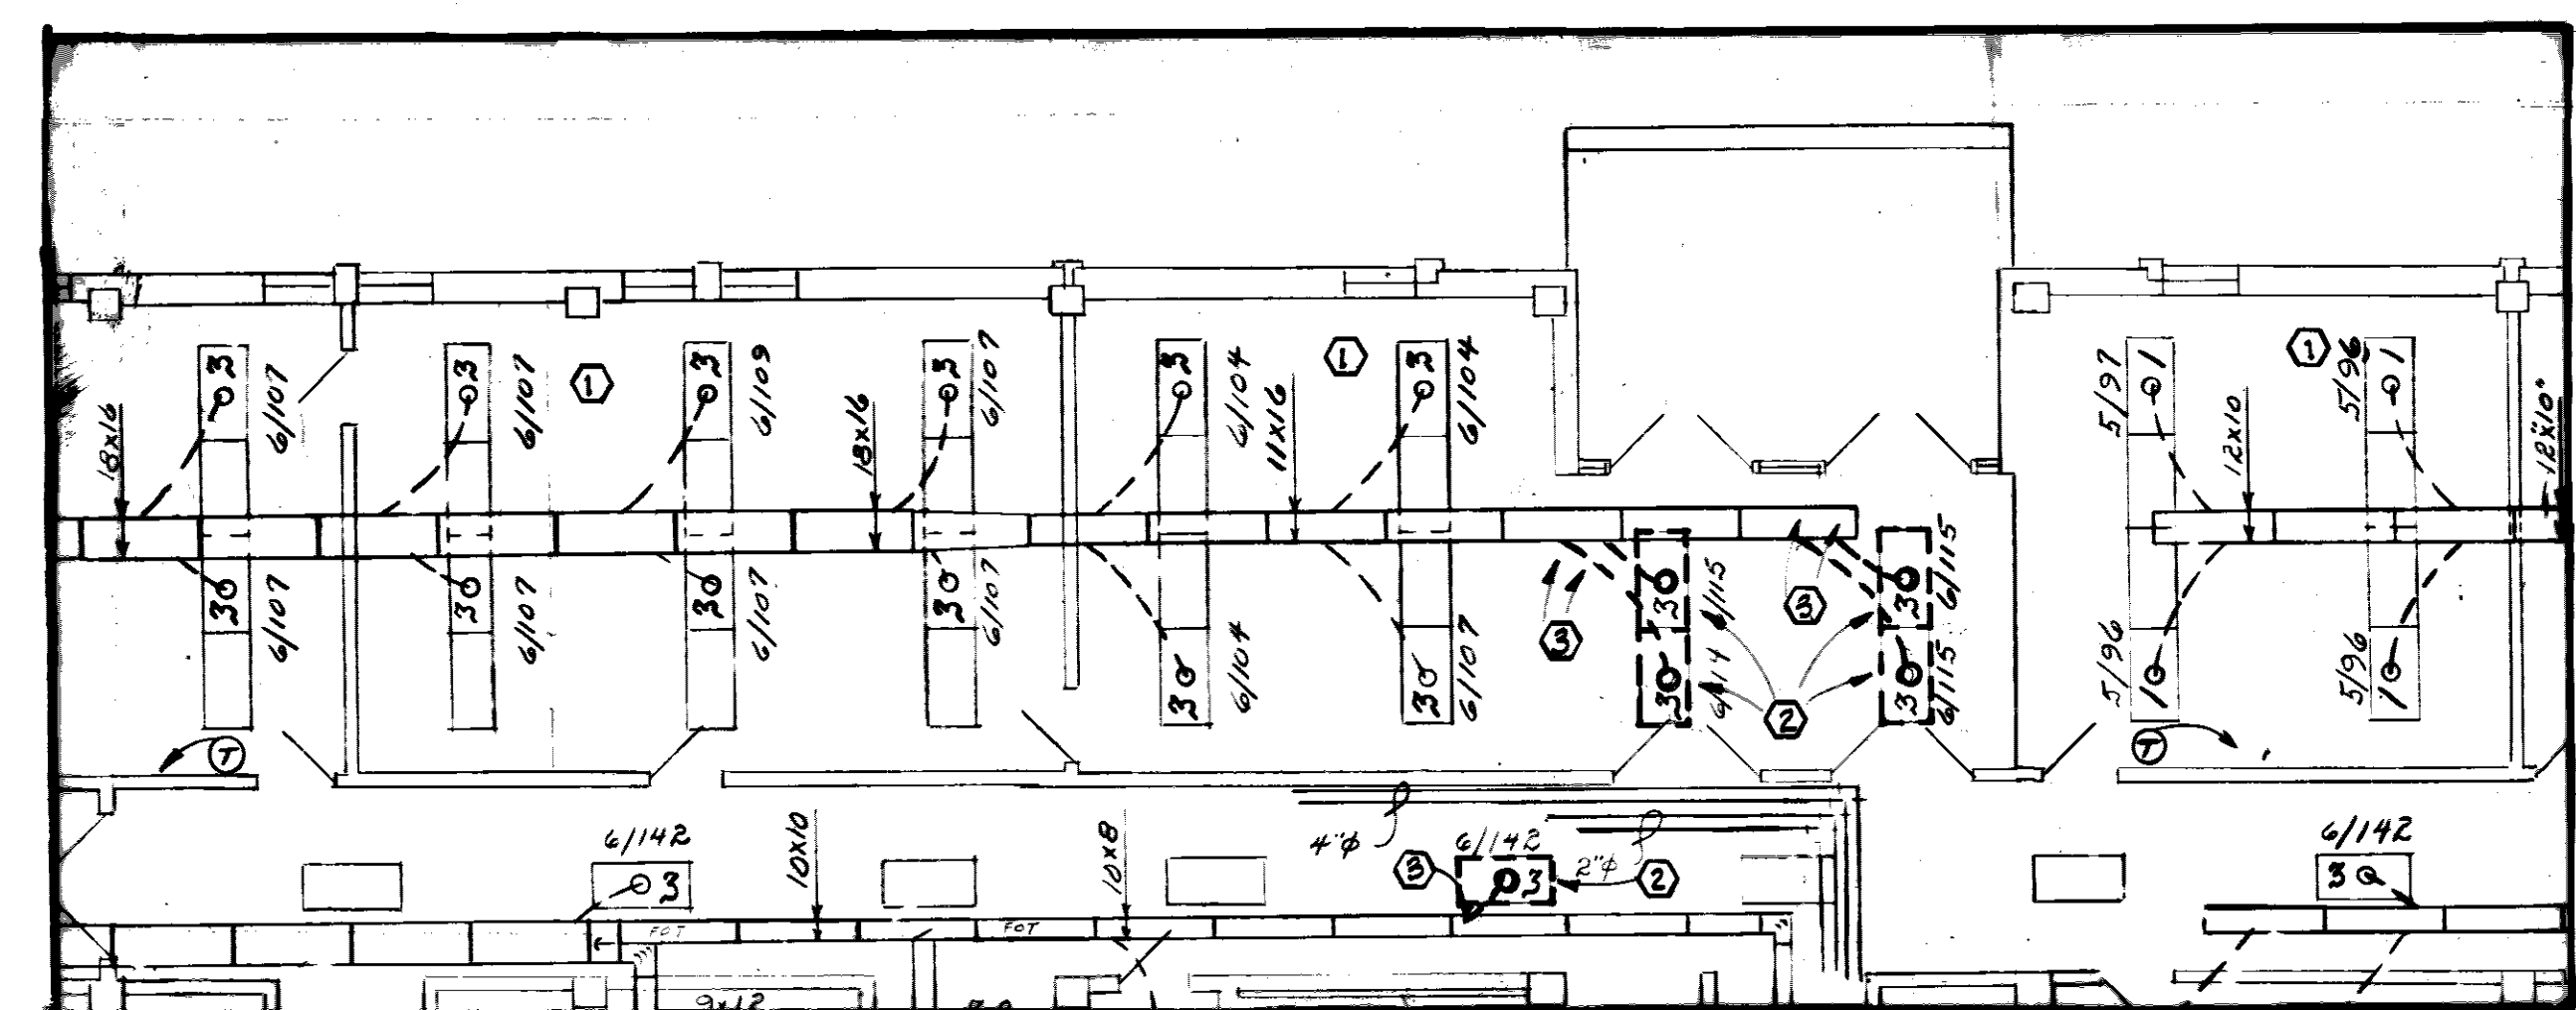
DETAIL "A" ELECTRICAL LIGHTING PLAN EXIST.
